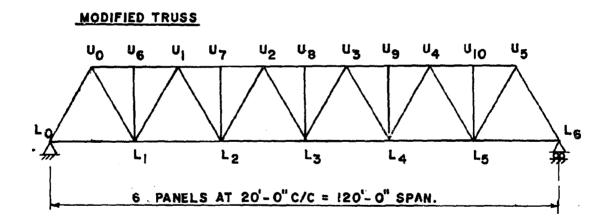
STRENGTHENING OF COMPRESSION MEMBER
